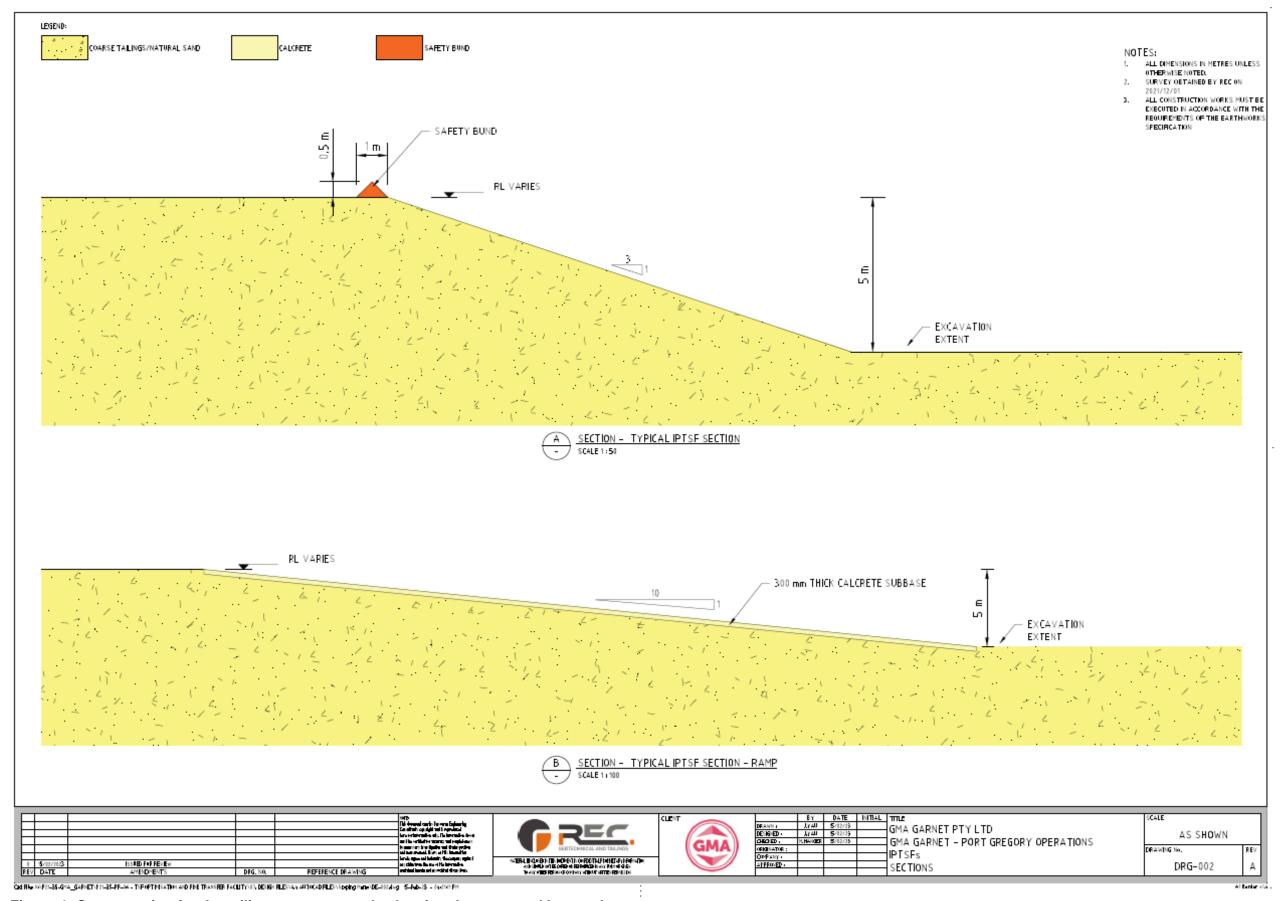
Cross section for the tailings storage ponds showing the ramp and batter slopes
